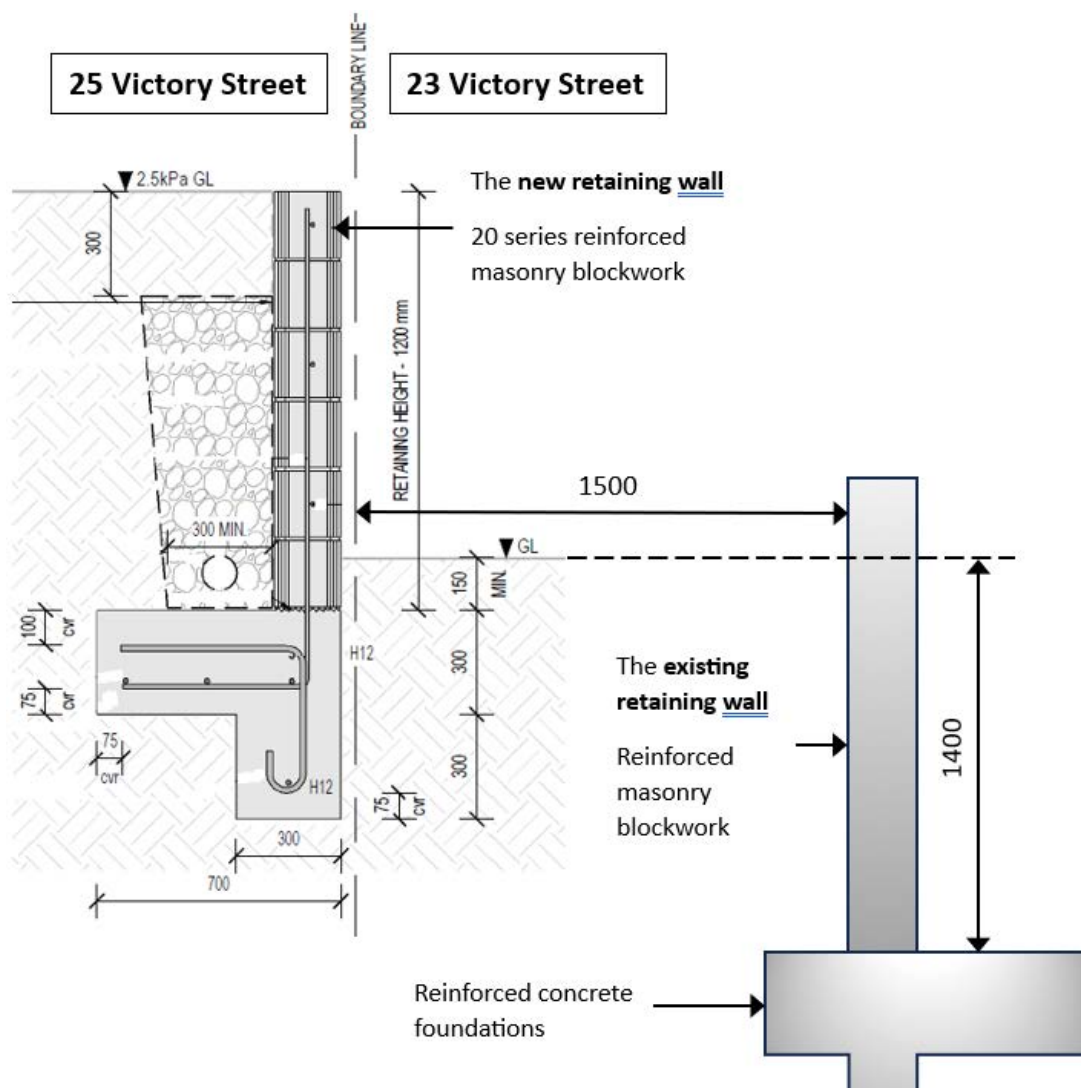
Generic cross-section (not to scale; dimensions are in millimetres)
